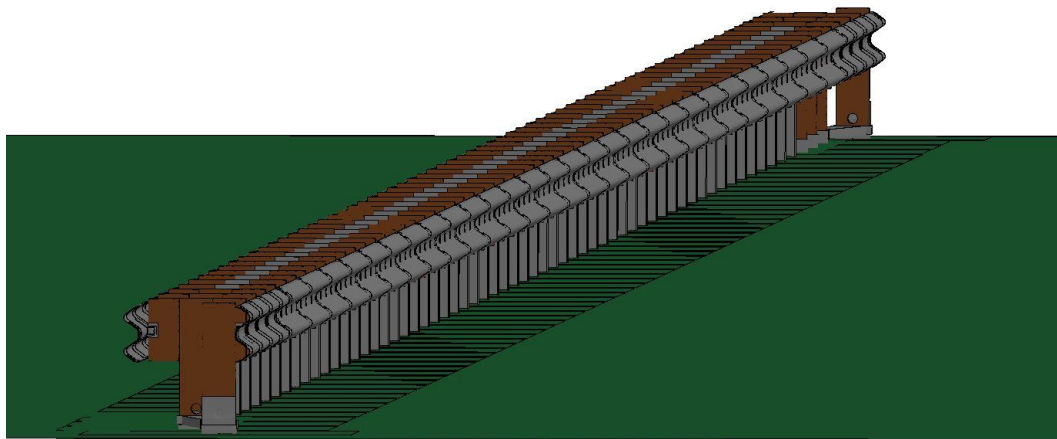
Full FE model of the double-faced 29-inch W-beam guardrail.
